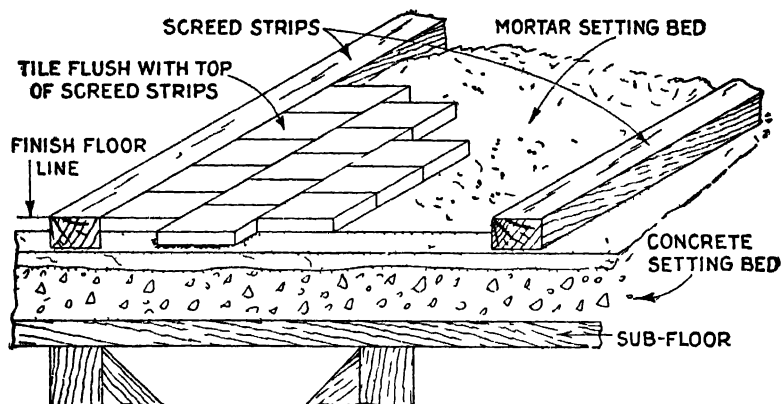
,856 —Screed strips or gauge of finished floor surface placed on top of concrete setting bed, showing mortar setting bed and a few tile in place the top surface of the tile being flush with top of screed strips
